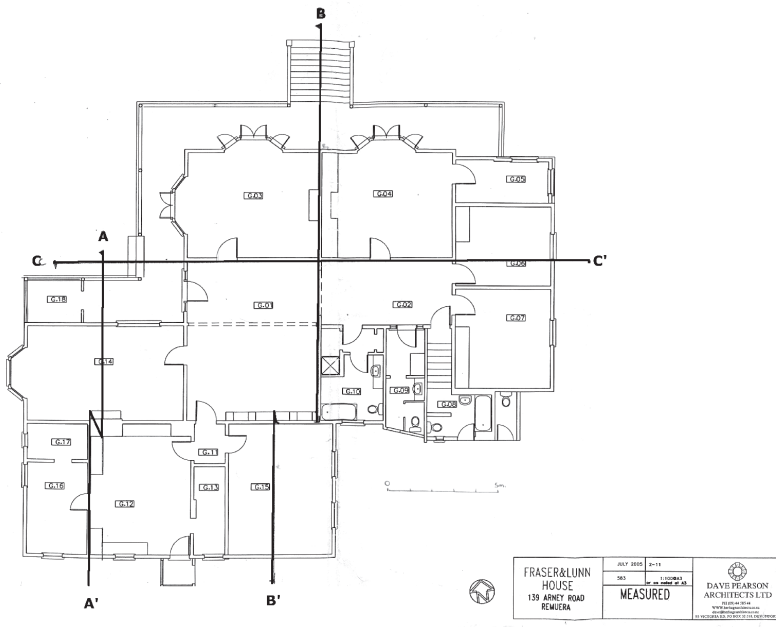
Floor plan of house (Pearson 2005: 18) showing the profiles drawn in detail for the current study.
